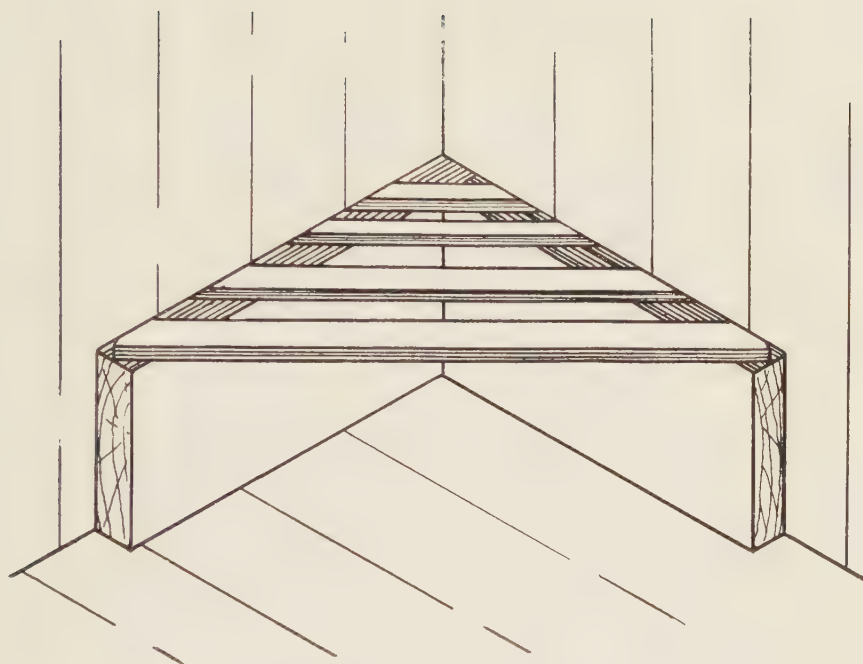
Detail of pig nest construction in corner of pen or house.
